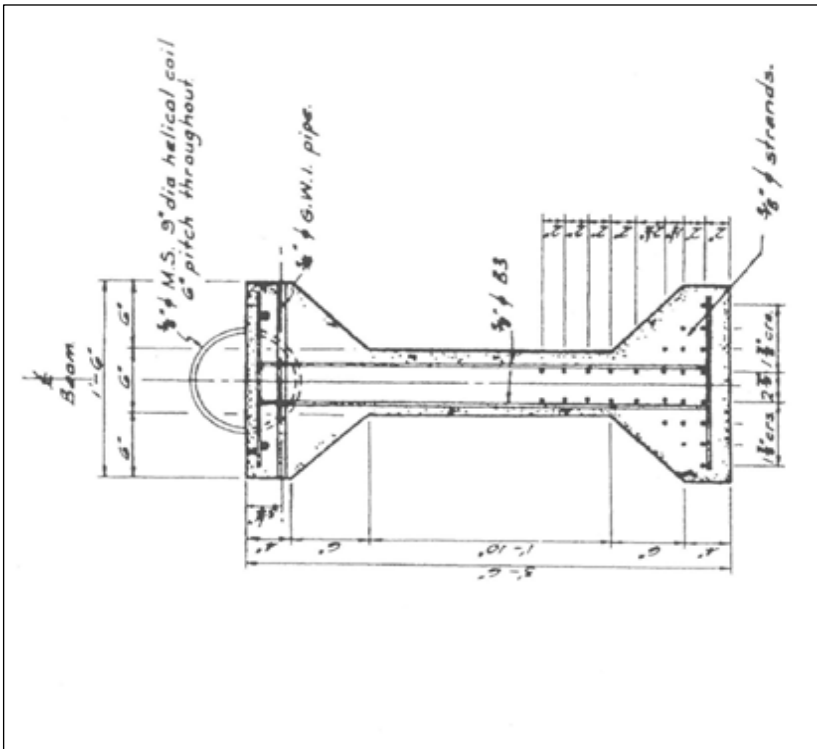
'Second generation' H20-S16-T16 design for a 45-foot span (Stirrat & Huizing 1961).
